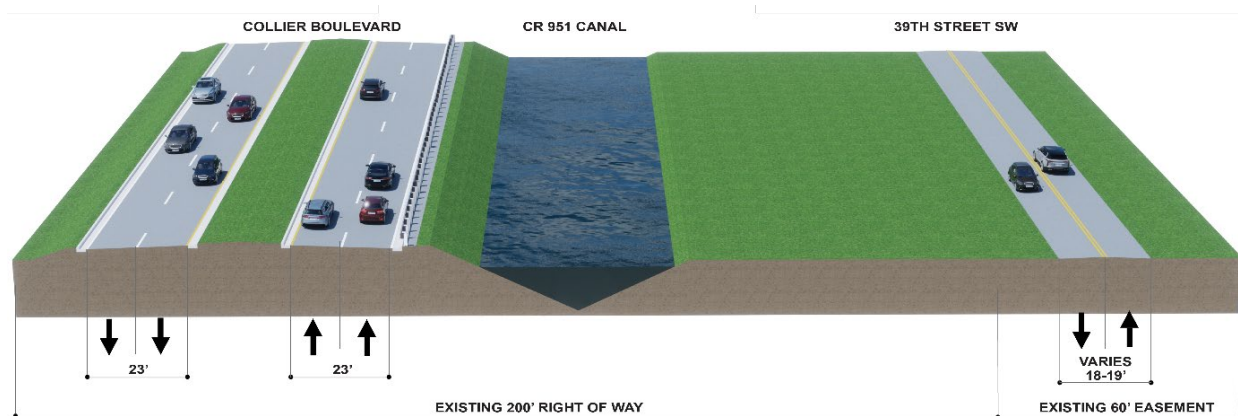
Existing Roadway Typical Section of Study Area (Looking North)
